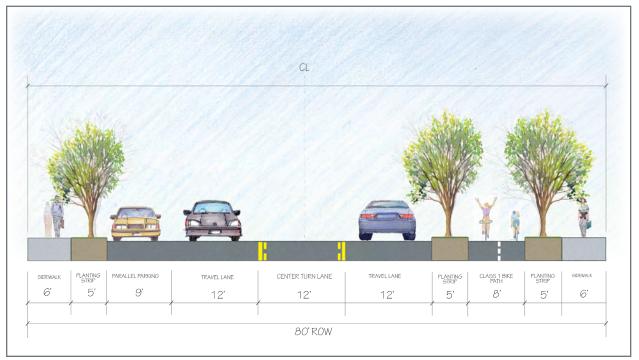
Farmersville Blvd Option 1 - Cross Section (typical)
